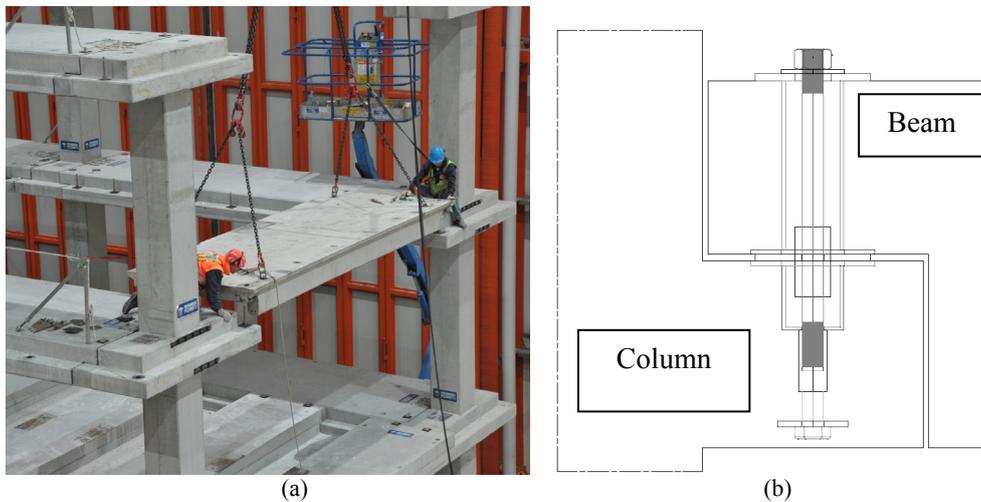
(a) Seating of a secondary beam on the column capital. (b) Detail of a pinned beam-column joint connection and a dowel with increased diameter at the critical section.
